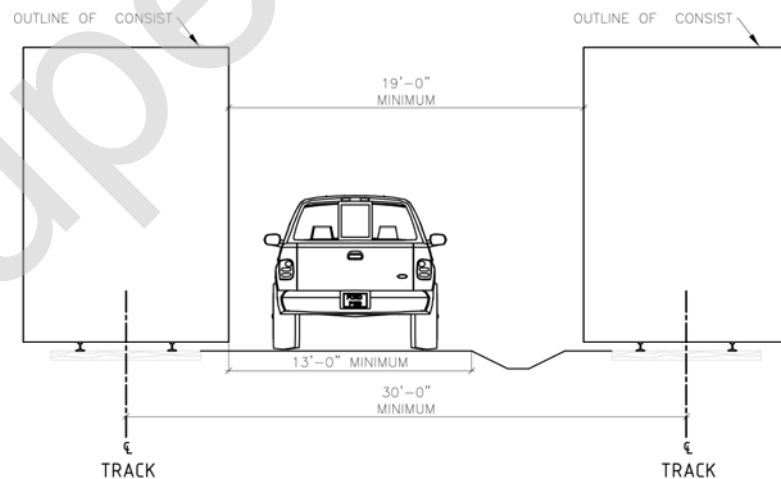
FIGURE: ONE WAY SERVICE ROAD WITH DRAINAGE DITCH (SURFACE AT TOP OF TIES)
